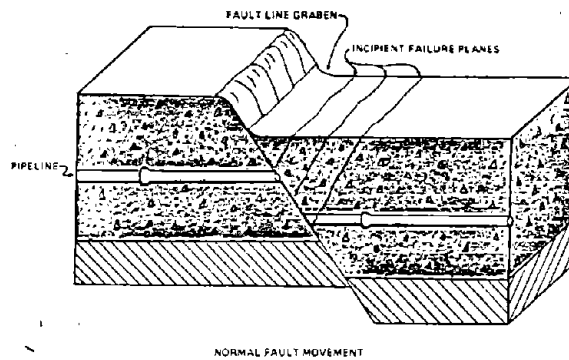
Example of pipeline failure at a fault crossing (044).
